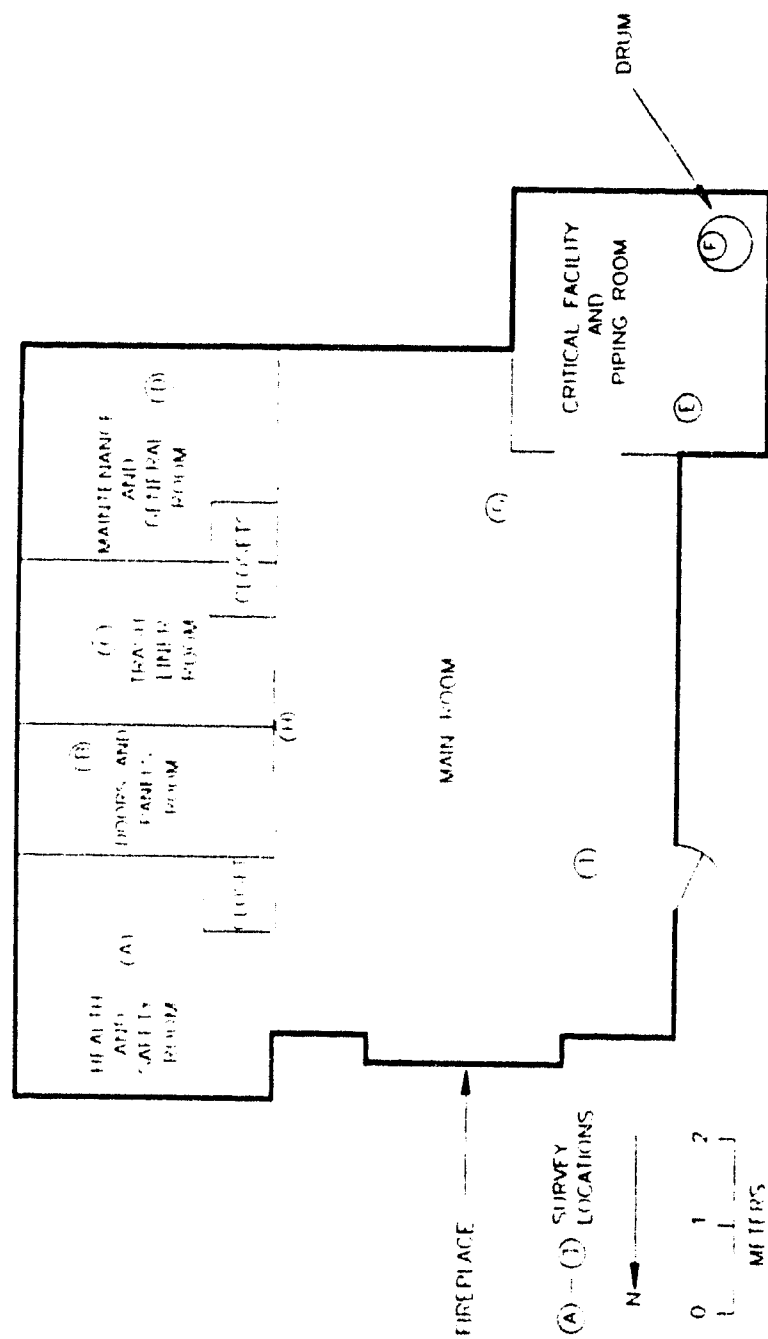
Floor Plan of the Lodge Showing Survey Locations
